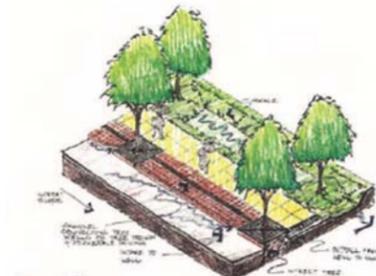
Street Tree Wells as Detention Basins for Sidewalk Runoff (Within Restricted Right of Way)
